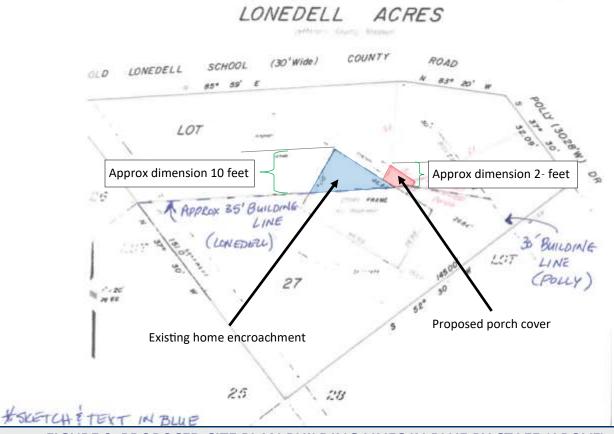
PROPOSED SITE PLAN BUILDING LINES IN BLUE BY STAFF (ABOVE)
